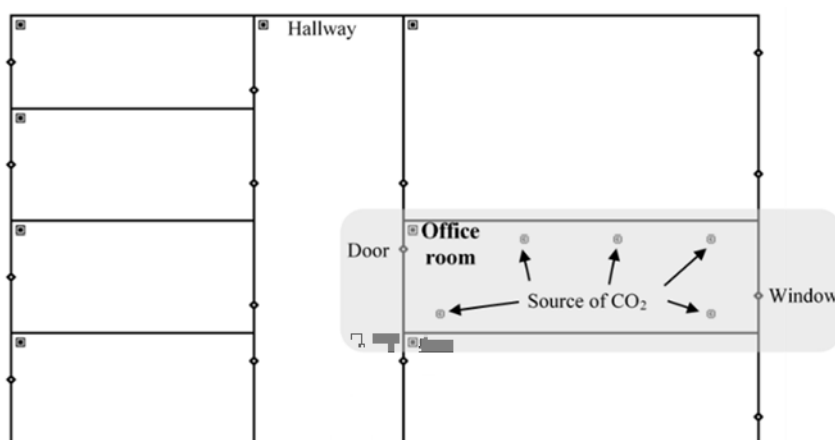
Section of the second-floor layout of the main building of the Department of Environment and Planning. The grey region highlights the office room selected for this case study.
